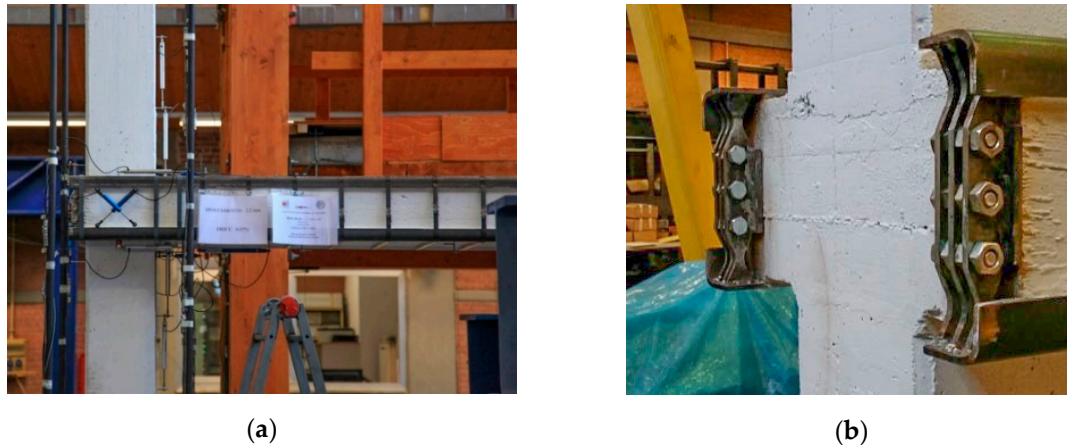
TS10 Specimen: (a) whole arrangement and (b) detail of the angles' connection by X-shaped elements.
